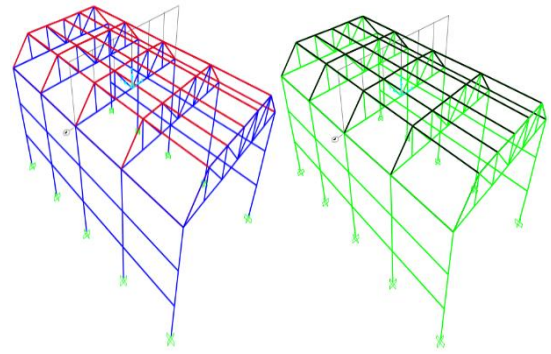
3D view of Pratt truss with steel or with cold formed steel
